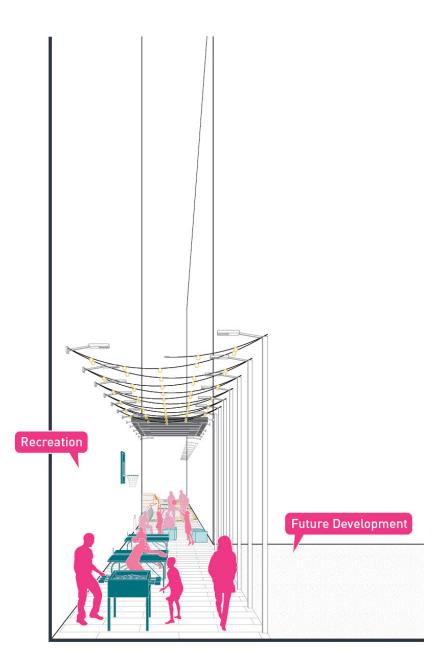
Laneway 5 Design; Section 5b, perspective section
